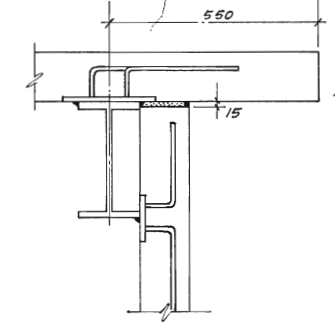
DETAIL T DETAIL U DETAIL V DETAIL W Typical
